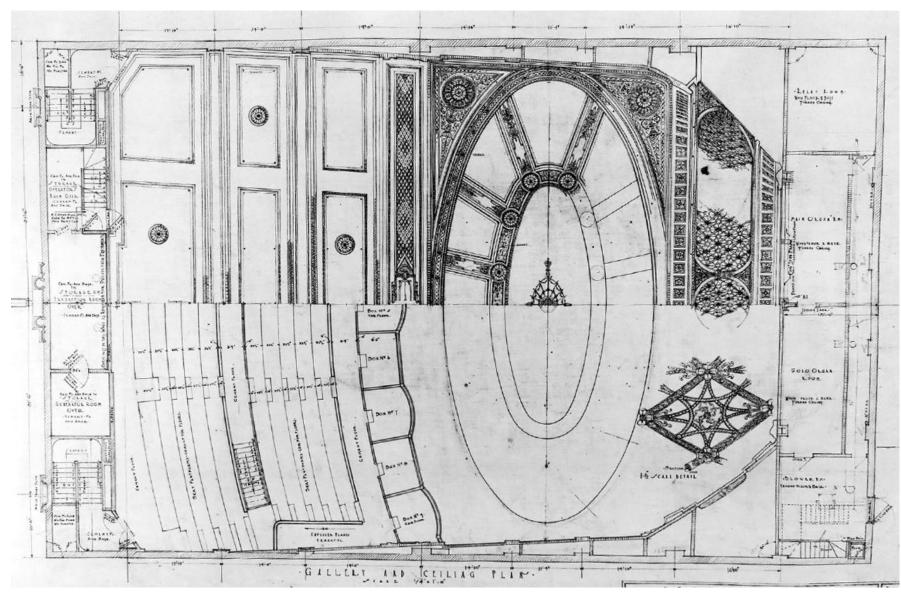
Byrd Theatre Original Hand-Drawn Ceiling Plan
